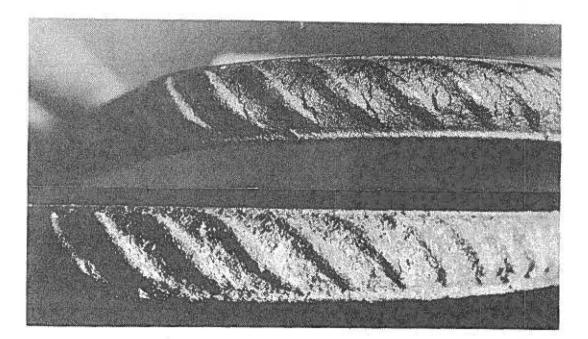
Hot-dip galvanized ø 8 deformed bar, bending radius 24 mm, bending angle 1350 – upper bar: after bending – lower bar: after a 1.5-year air storage
